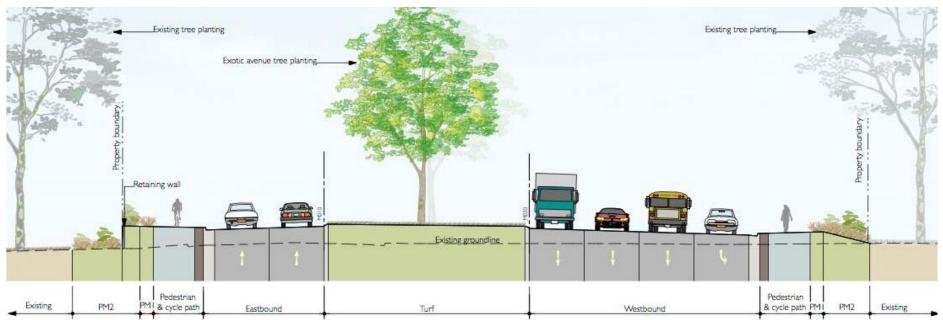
Typical cross section near the North West Rail Link overbridge
